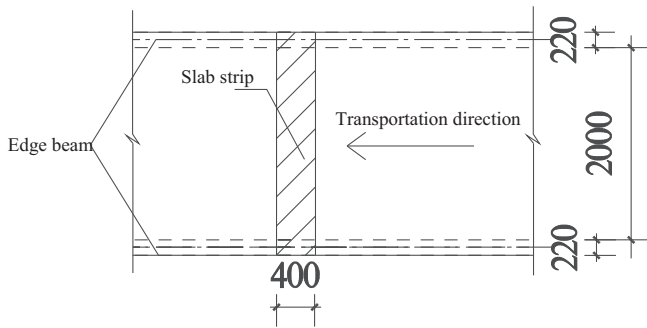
One-way slab strip located in a global deck slab (unit: mm).
